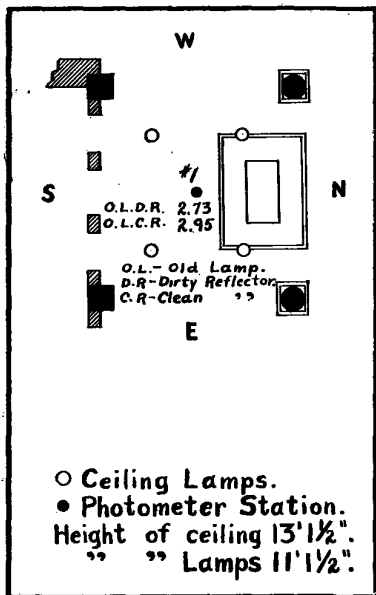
Section plan of fourth floor, (toy department), showing location of furniture, pillars, lighting units, test stations and illumination data.
